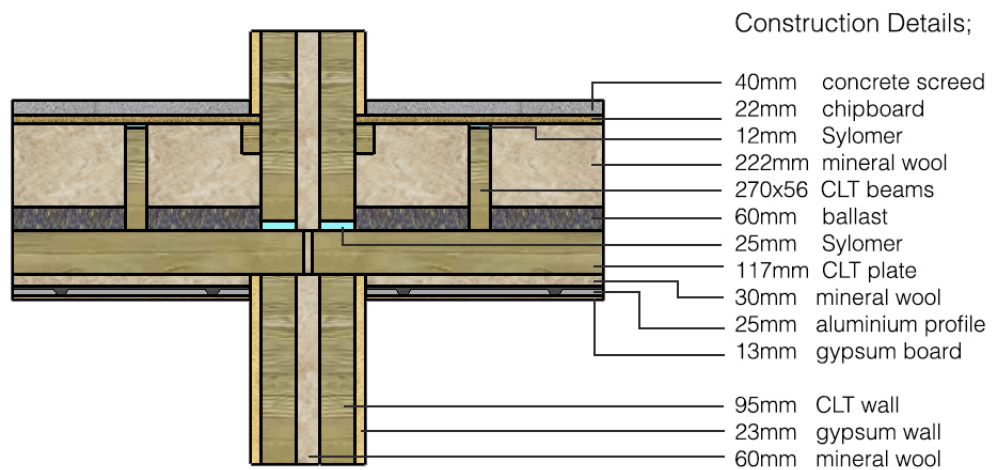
Structural section showing the materials included in a junction of 4 adjacent apartments of the test building. Picture based on construction plans of FristadsBygg [7].
